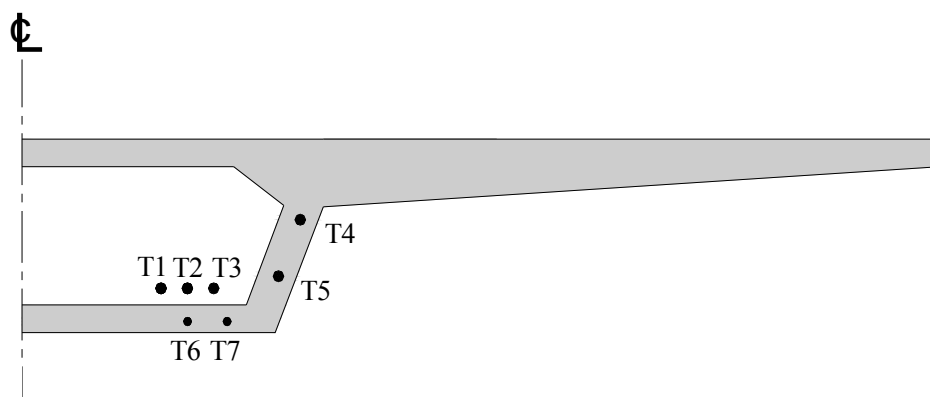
Cross Section of a PT Box Girder With Internal and External Tendons.
